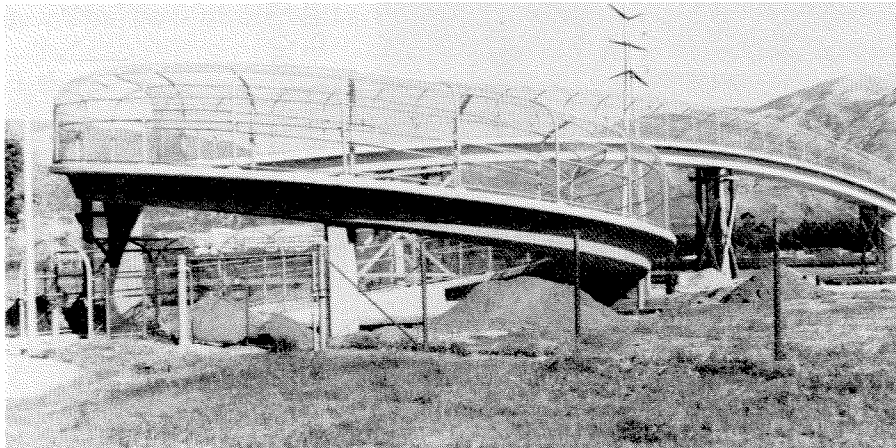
Tyler Street footbridge, Foothill freeway.
